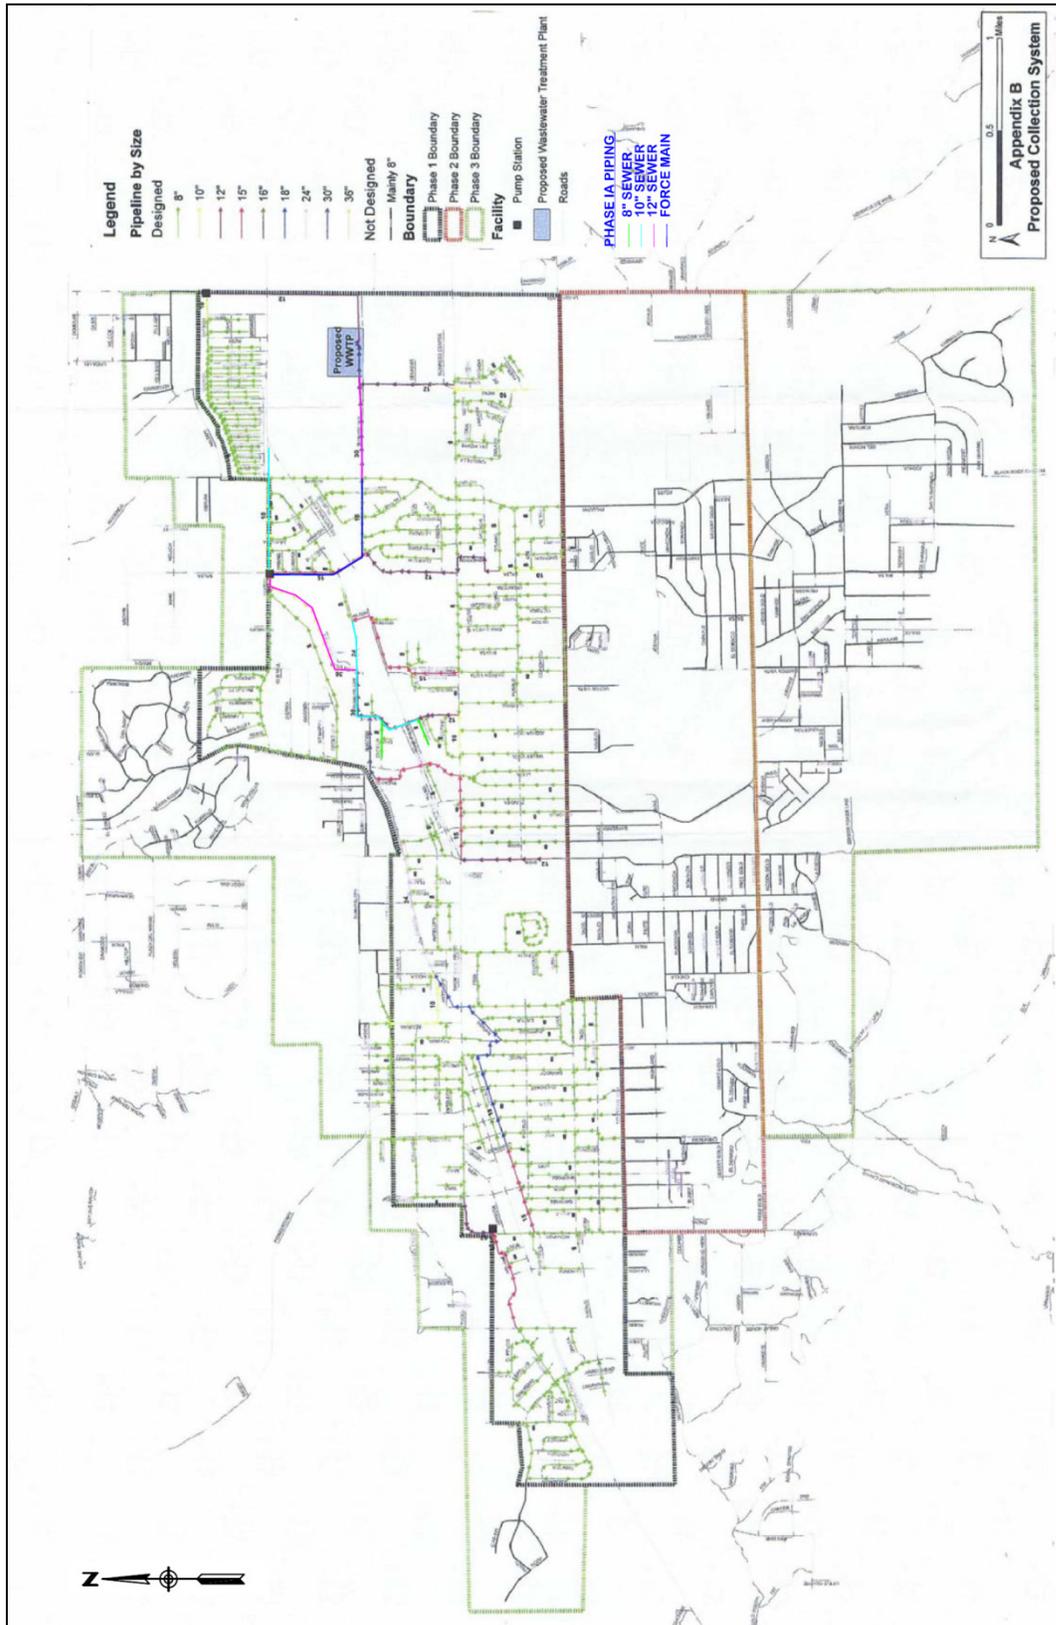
HDWD Water Treatment Plant Phase 1 Collection System Detail
